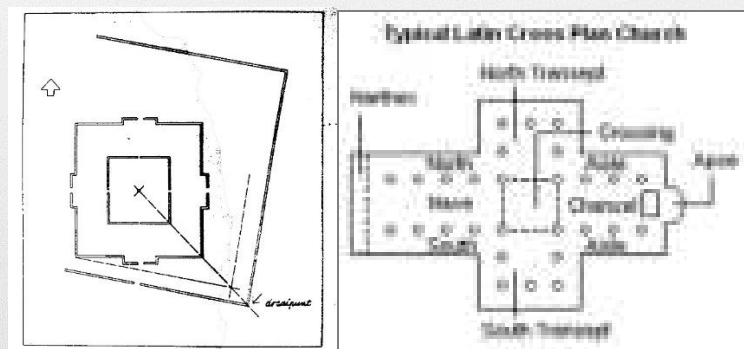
Ground Plan of Main Building from Puhsarang Church (left)[5]; Ground plan of Rome Basilica (right)[8]
